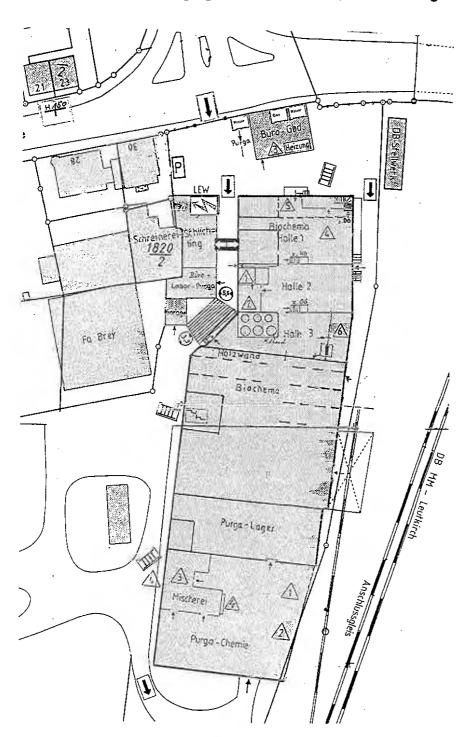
Plan of the building (part of the fire brigade's operations plan).
